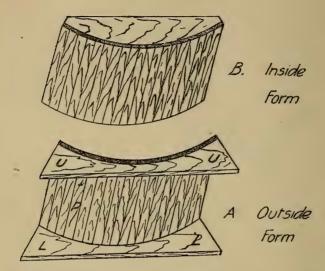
Illustrates method of making form for constructing concrete walls. The forms are made of plank and are made in sections 4 to 10 feet long, requiring 5 to 8 sections to complete the circle.
